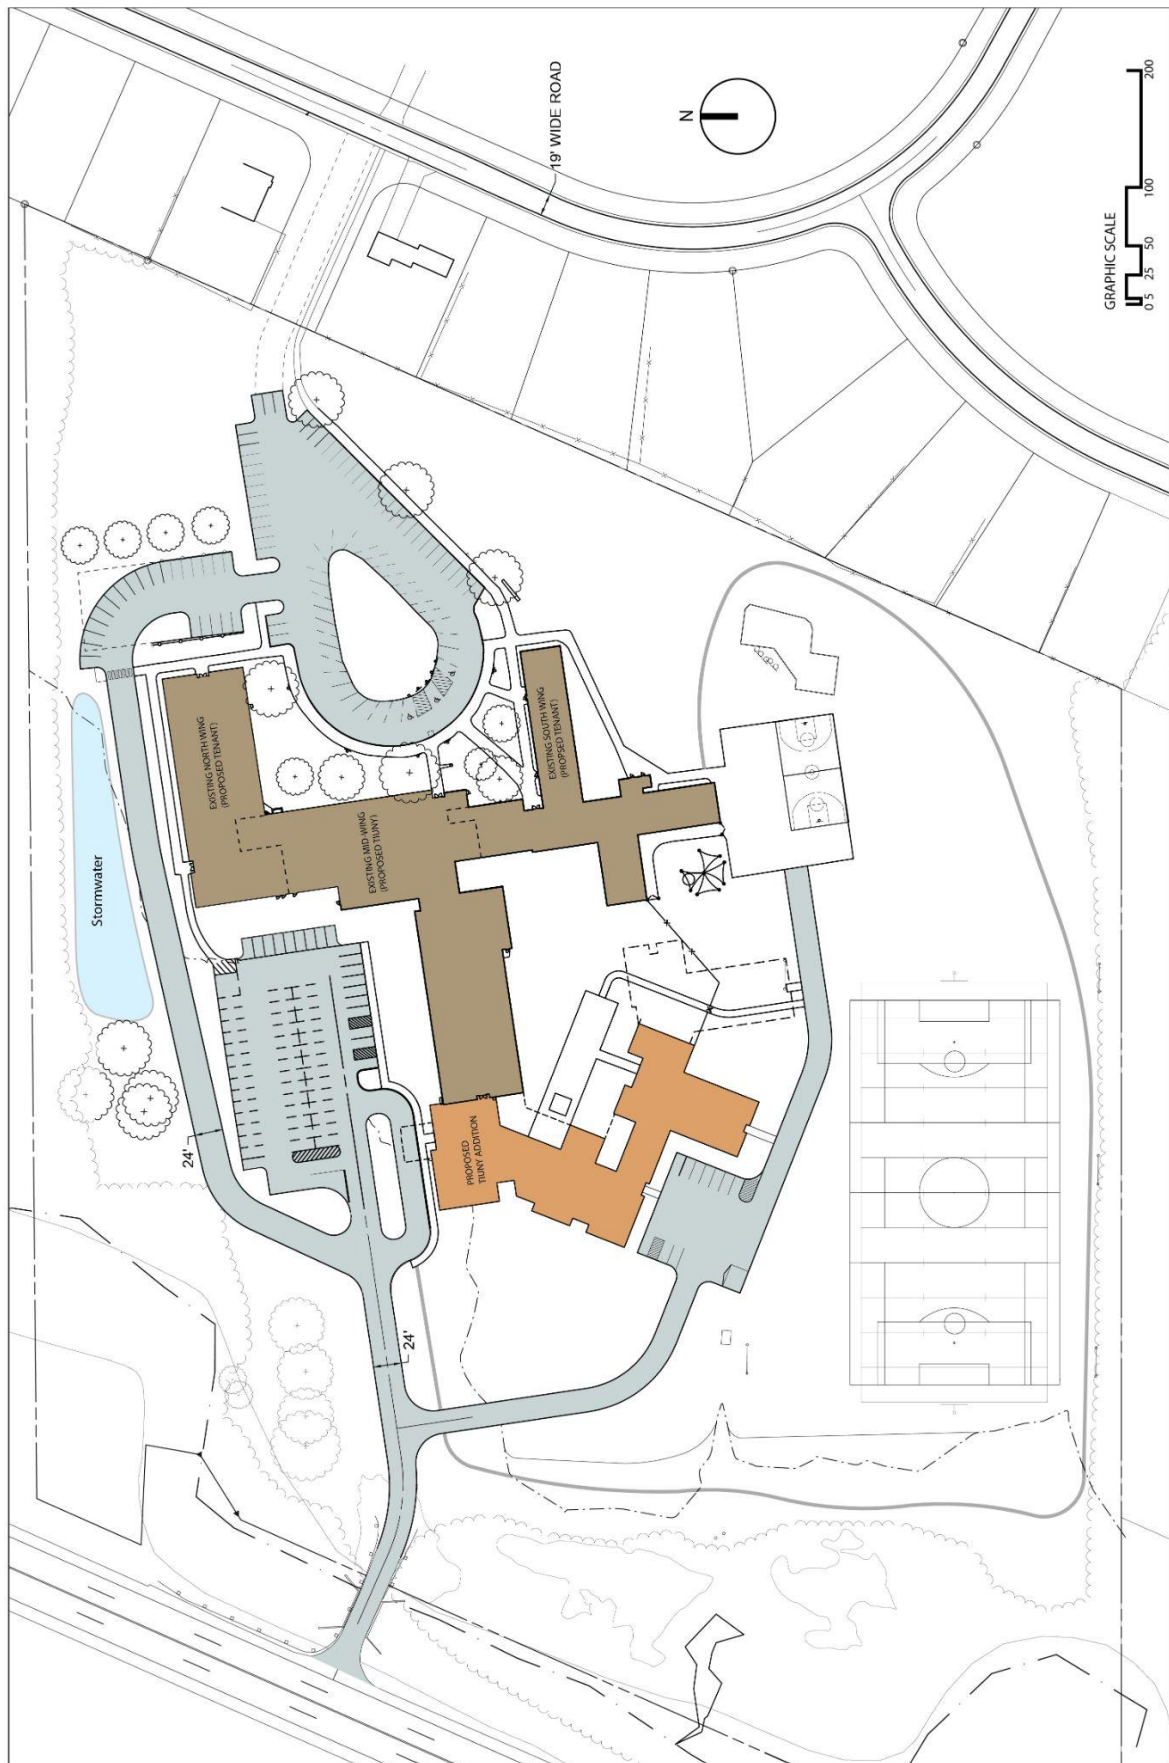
Proposal to close the Idlewood vehicle entrance and add a connecting driveway to the north of the building
